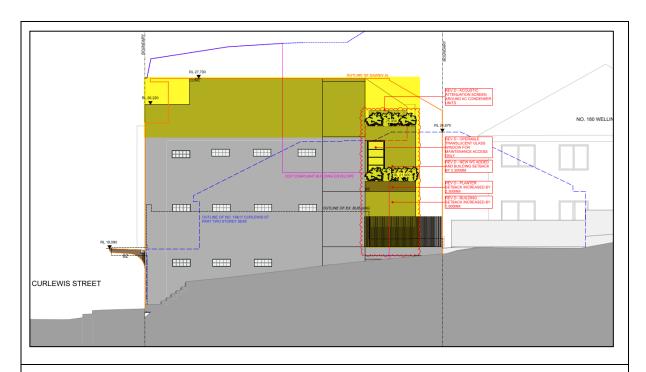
(above): Built form based on recommendation to increase rear setback at levels 1 and 2, as well as delete top level depicted over applicant's architectural plans of the west elevation. Yellow highlighted section generally depicts form to be deleted.
